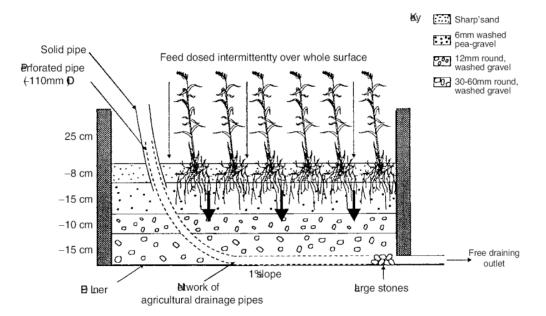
Typical arrangement of a vertical down-flow constructed wetland (Cooper et al., 1996)
